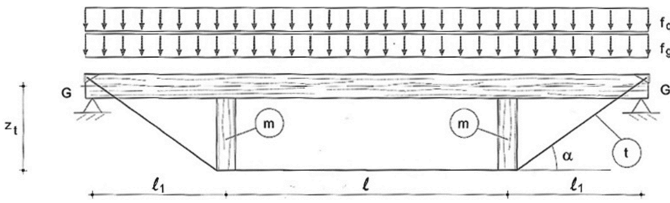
Double harping point reinforcement for a timber roof beam (Giuriani 2011)
